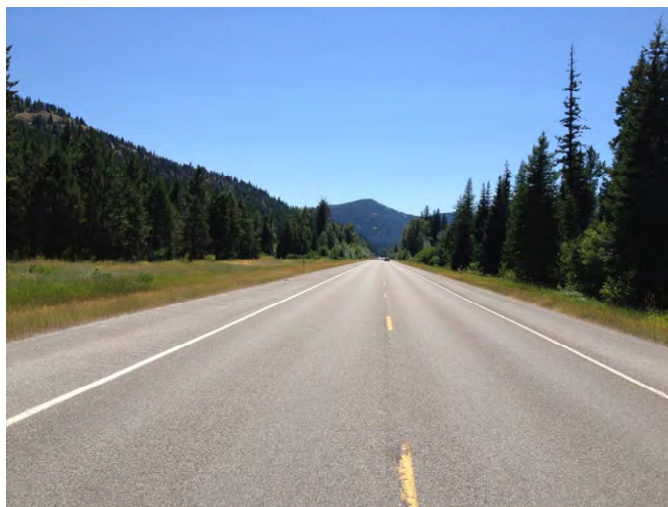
Segment 1, RP 58.5±, looking eastbound.
